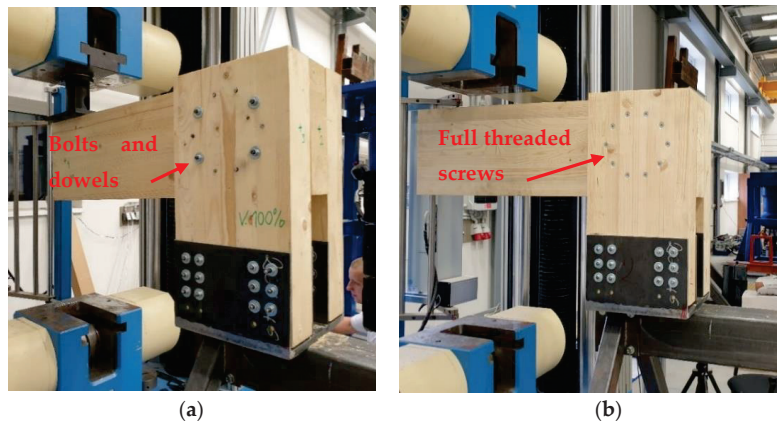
Experimental specimens: (a) Experiment A, bolts and dowels; (b) Experiment B, fully threaded screws; see *Johanides 2022* [43].
